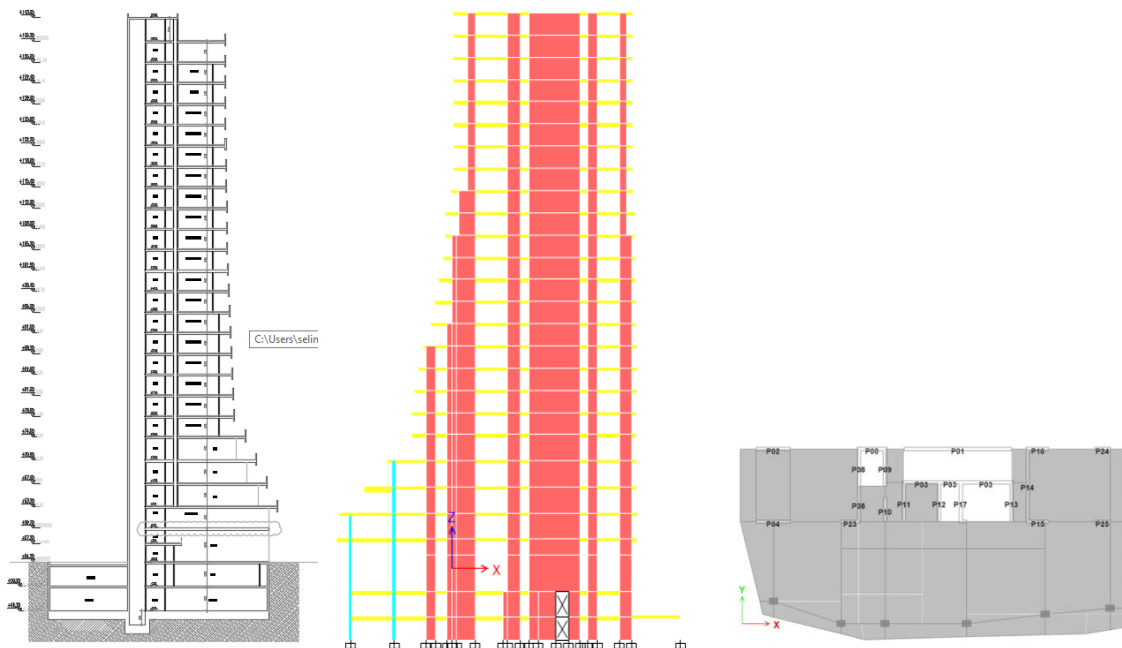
The cross-sectional and plan views of the 28-storey building used in the study
